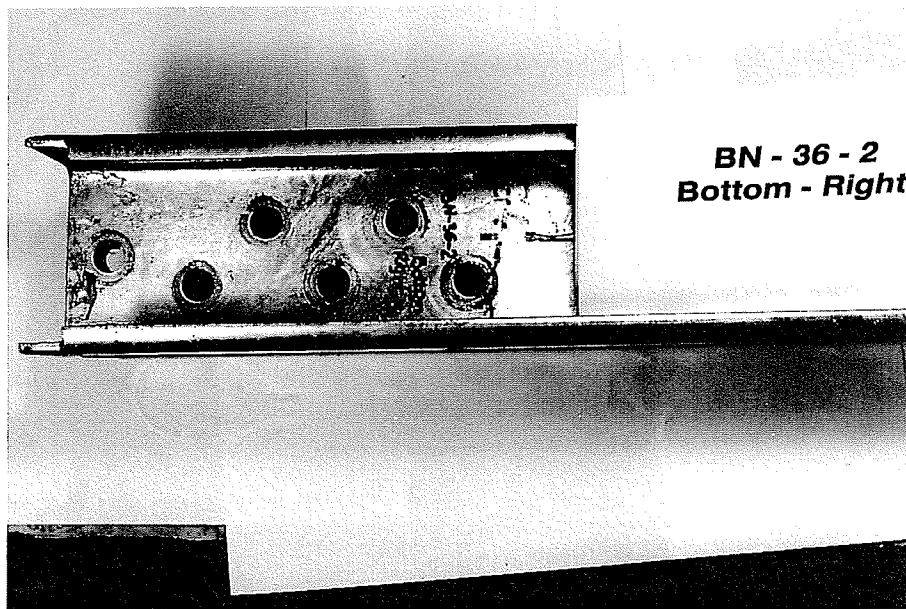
Staggered Bolt Pattern for Back-to-Back Channel Specimens.
